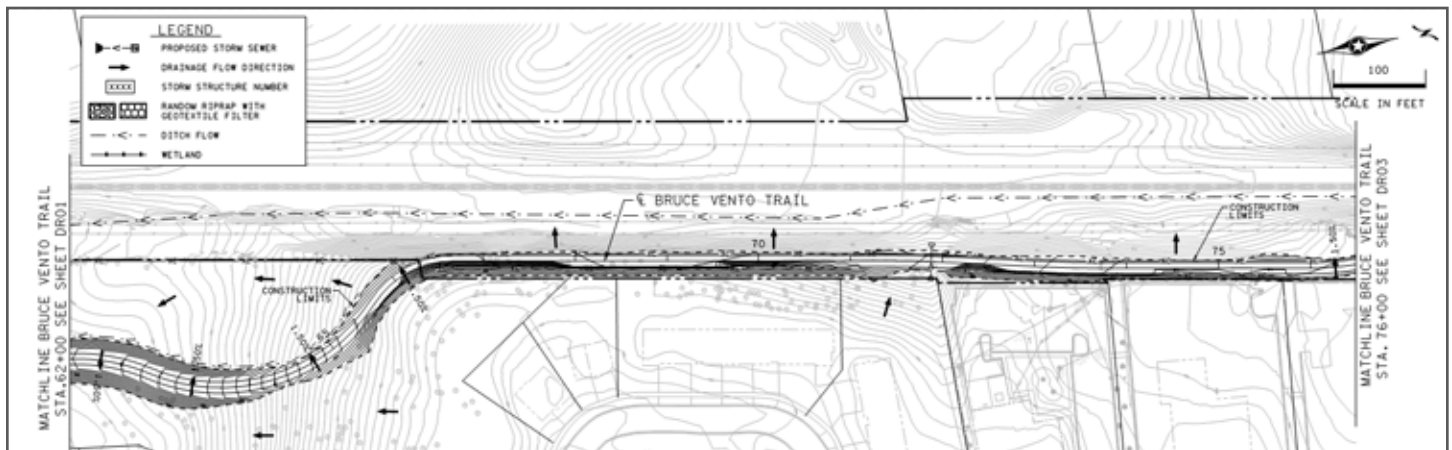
A Plan Sheet Example of the Bruce Vento Trail Segment 3 Construction Plans Showing the Relationship of the Bruce Vento Trail to the BNSF Rail Corridor Along with Grading and Drainage Construction Requirements
